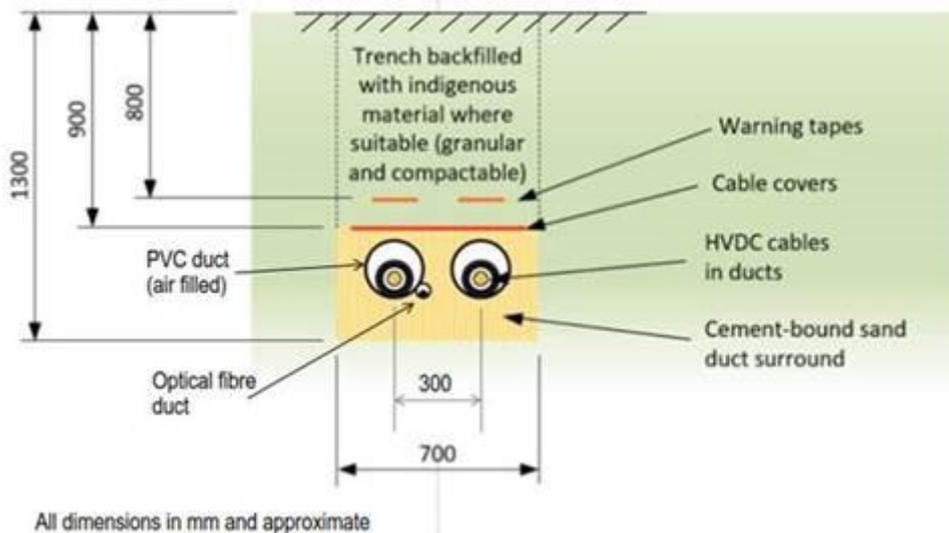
Typical HVDC Trench Cross-Section (source: WSP | not to scale)
